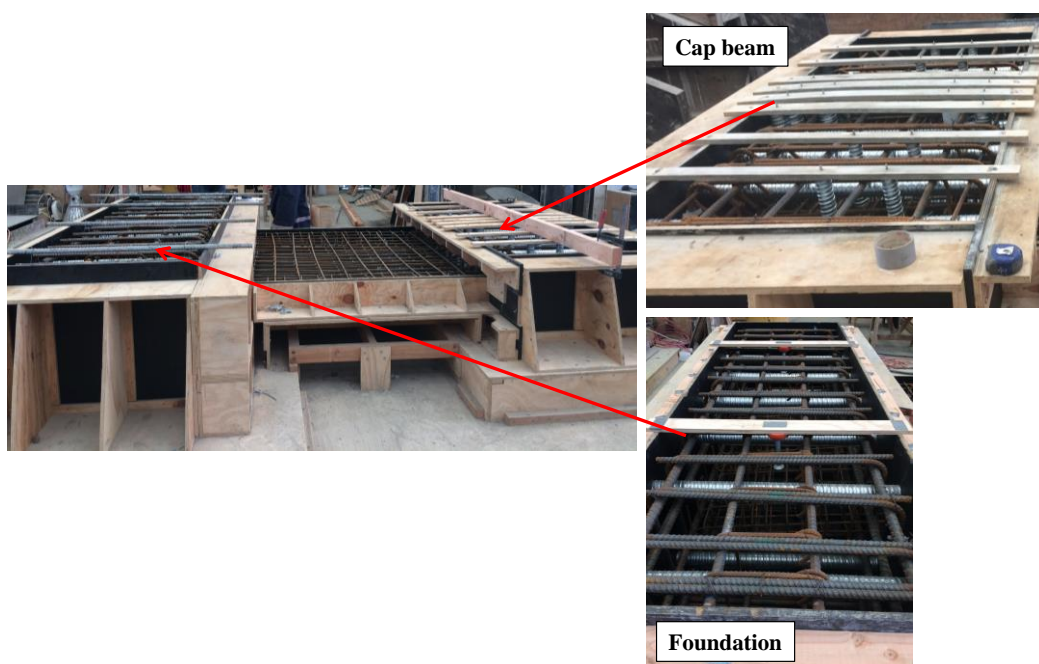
Crossbachs embedded in the cap beam and the foundation
